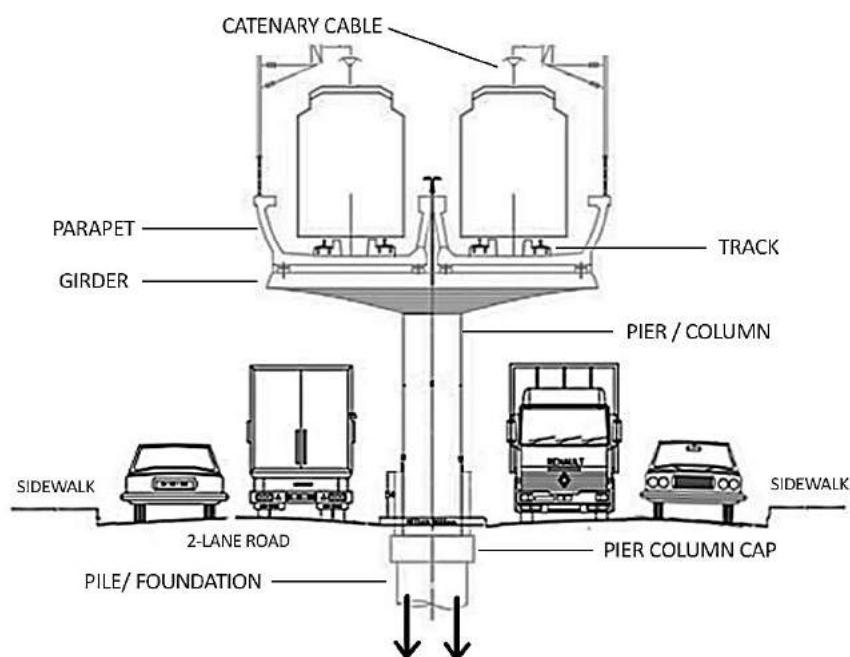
Typical Cross-Section of a Railway Viaduct Assembly on 4-lane Road
